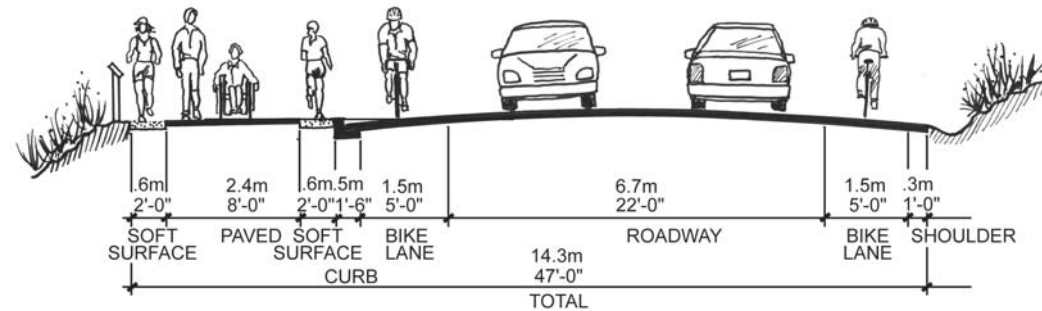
Proposed Development at Lincoln Boulevard at Pershing Drive North
